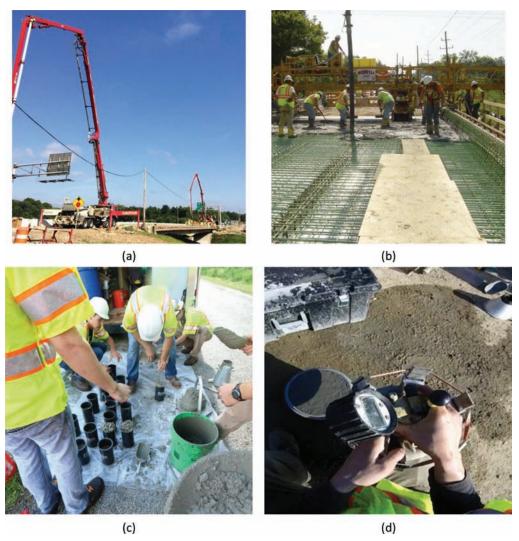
Testing on site at bridge location shows (a) concrete pumping apparatuses, (b) concrete placement in bridge deck, (c) making hardened samples for later age testing, and (d) Super Air Meter testing.
